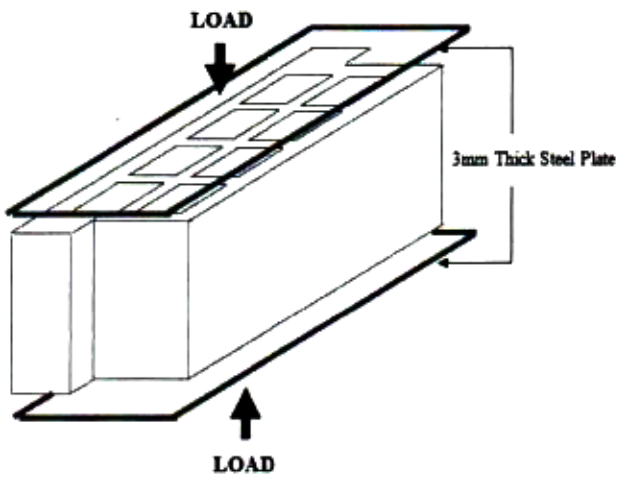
Loading arrangement for burnt clay hollow block parallel to the holes
